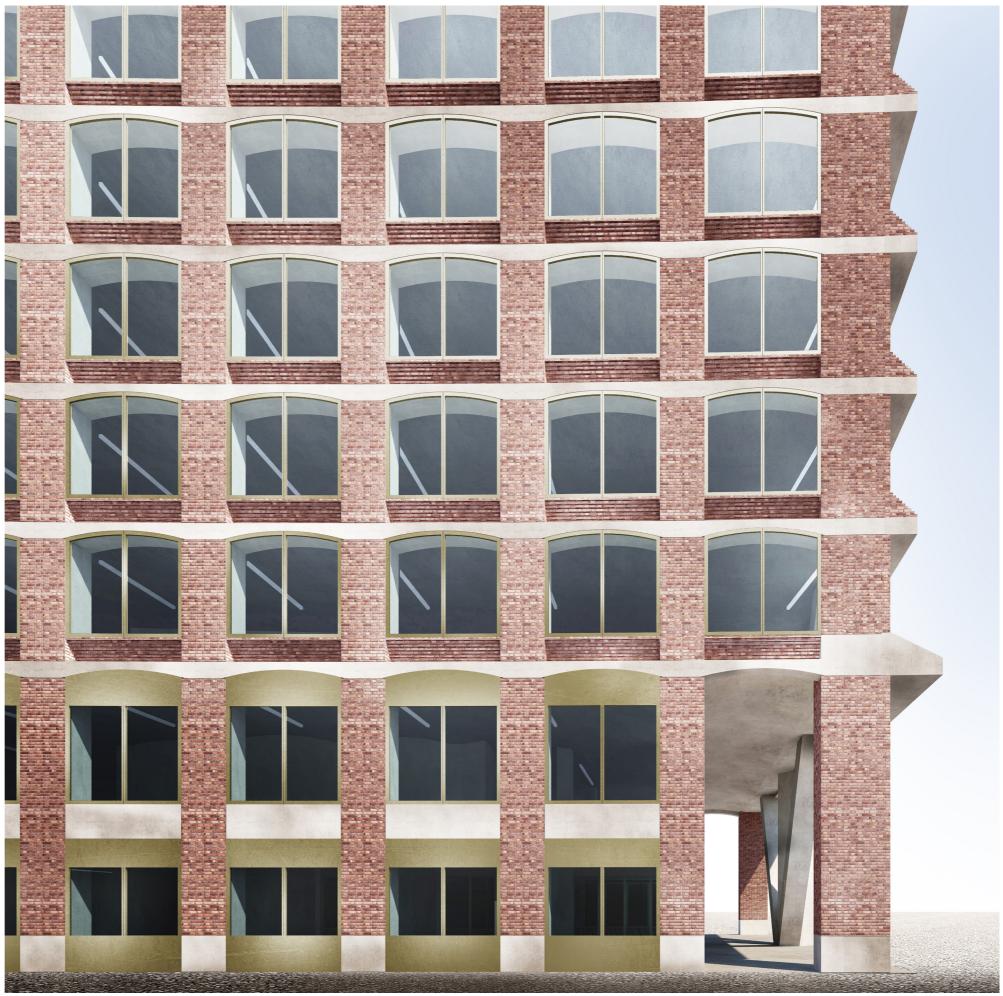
West Block North Façade detail view - bottom & middle
